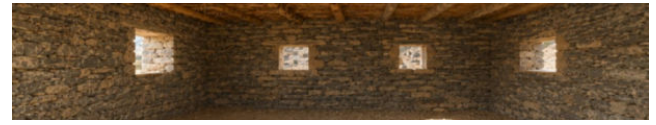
(e): Interior View – Interior view of the structure build with locally sources stone walls, providing natural insulation and strength.
